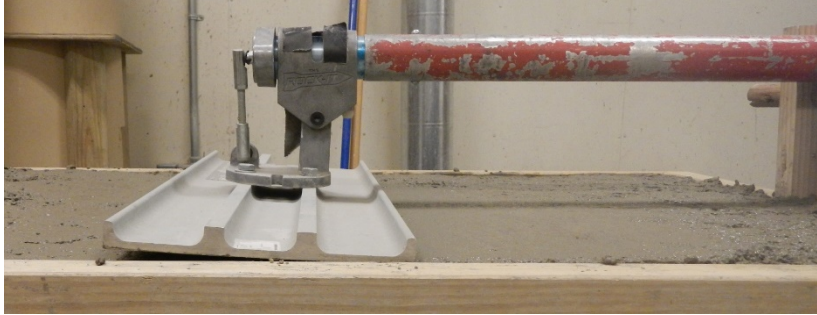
A bull-float is used to smooth the surface of the concrete
